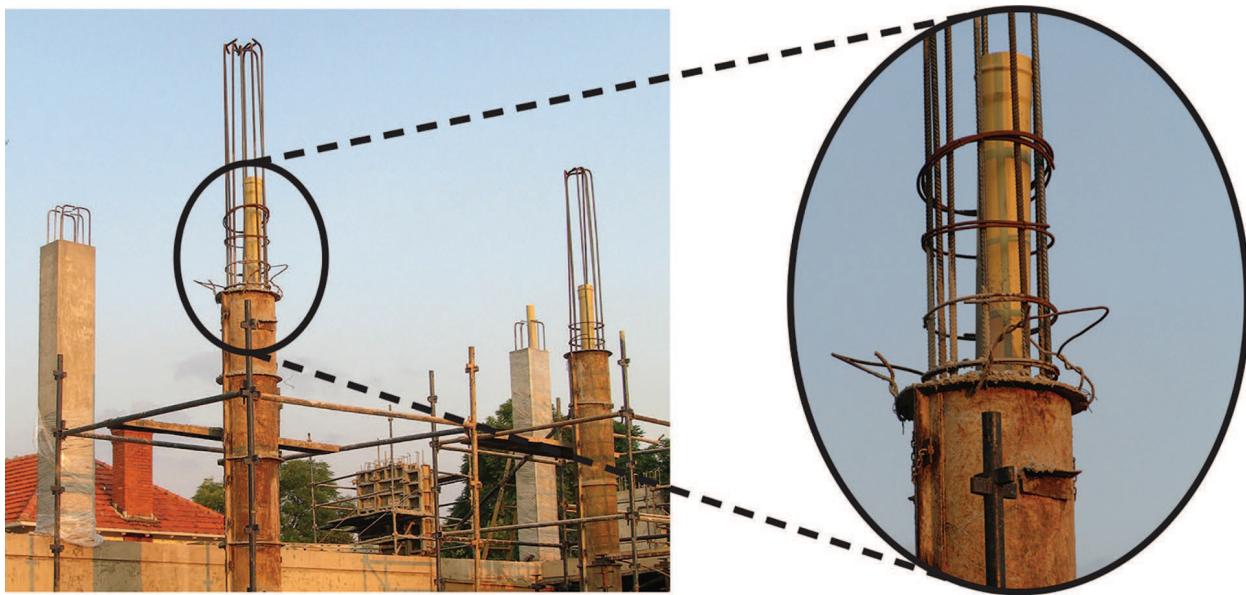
Steel reinforcement is put inside a concrete pillar of a big building.
